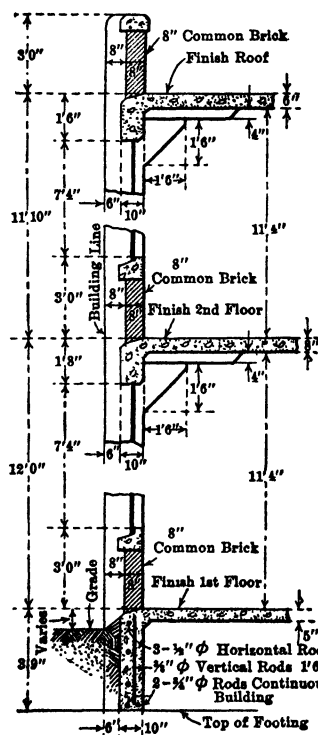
Flat Slab Construction. Vertical Section Showing Lintel Beams and Panel Walls
